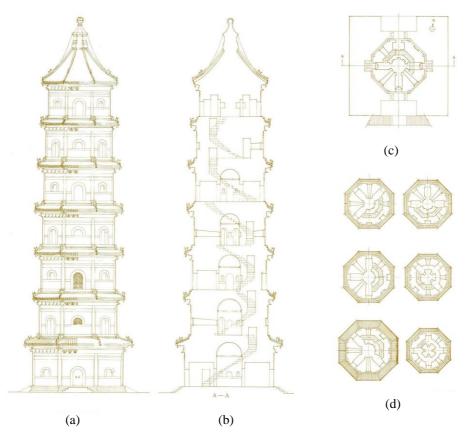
Yufeng Pagoda (tower-style pagoda), Beijing a) Elevation b) Cross Section c) Ground Floor Plan d) Floor Plans (Source: Zhang et al., 1986: 201)
